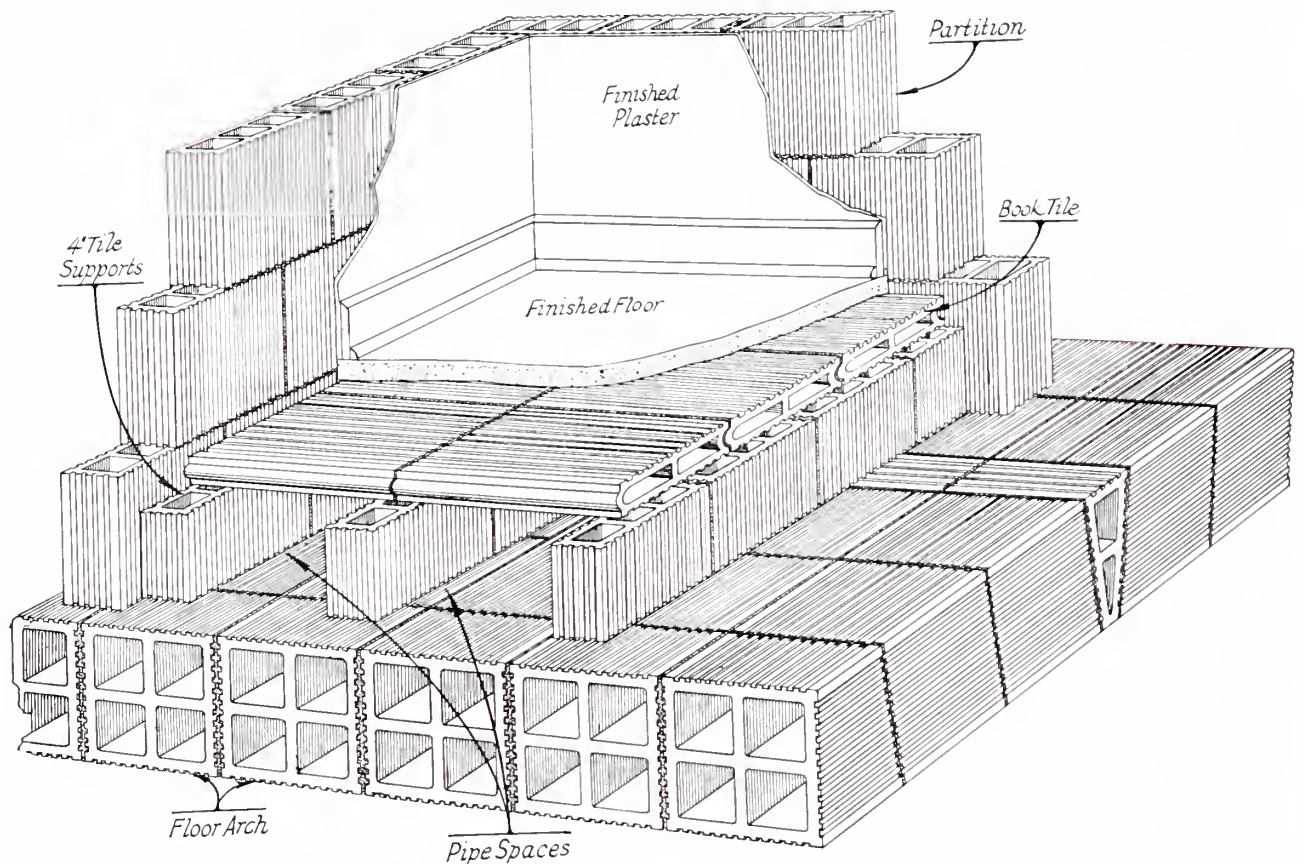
Illustrating the use of book tile with partition tile supports in the construction of raised floors. Note pipe spaces provided between supports.
